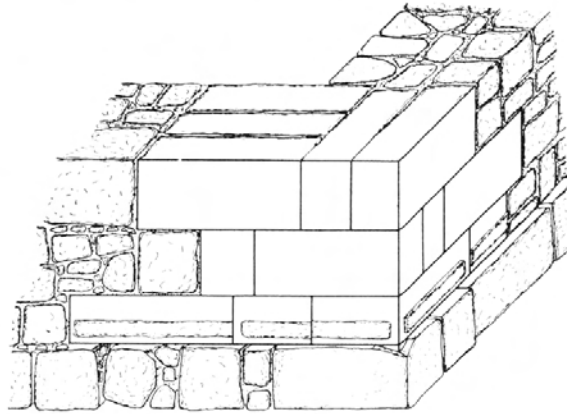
ISOMETRIC SKETCH OF SOUTHEAST CORNER OF BUILDING 338
